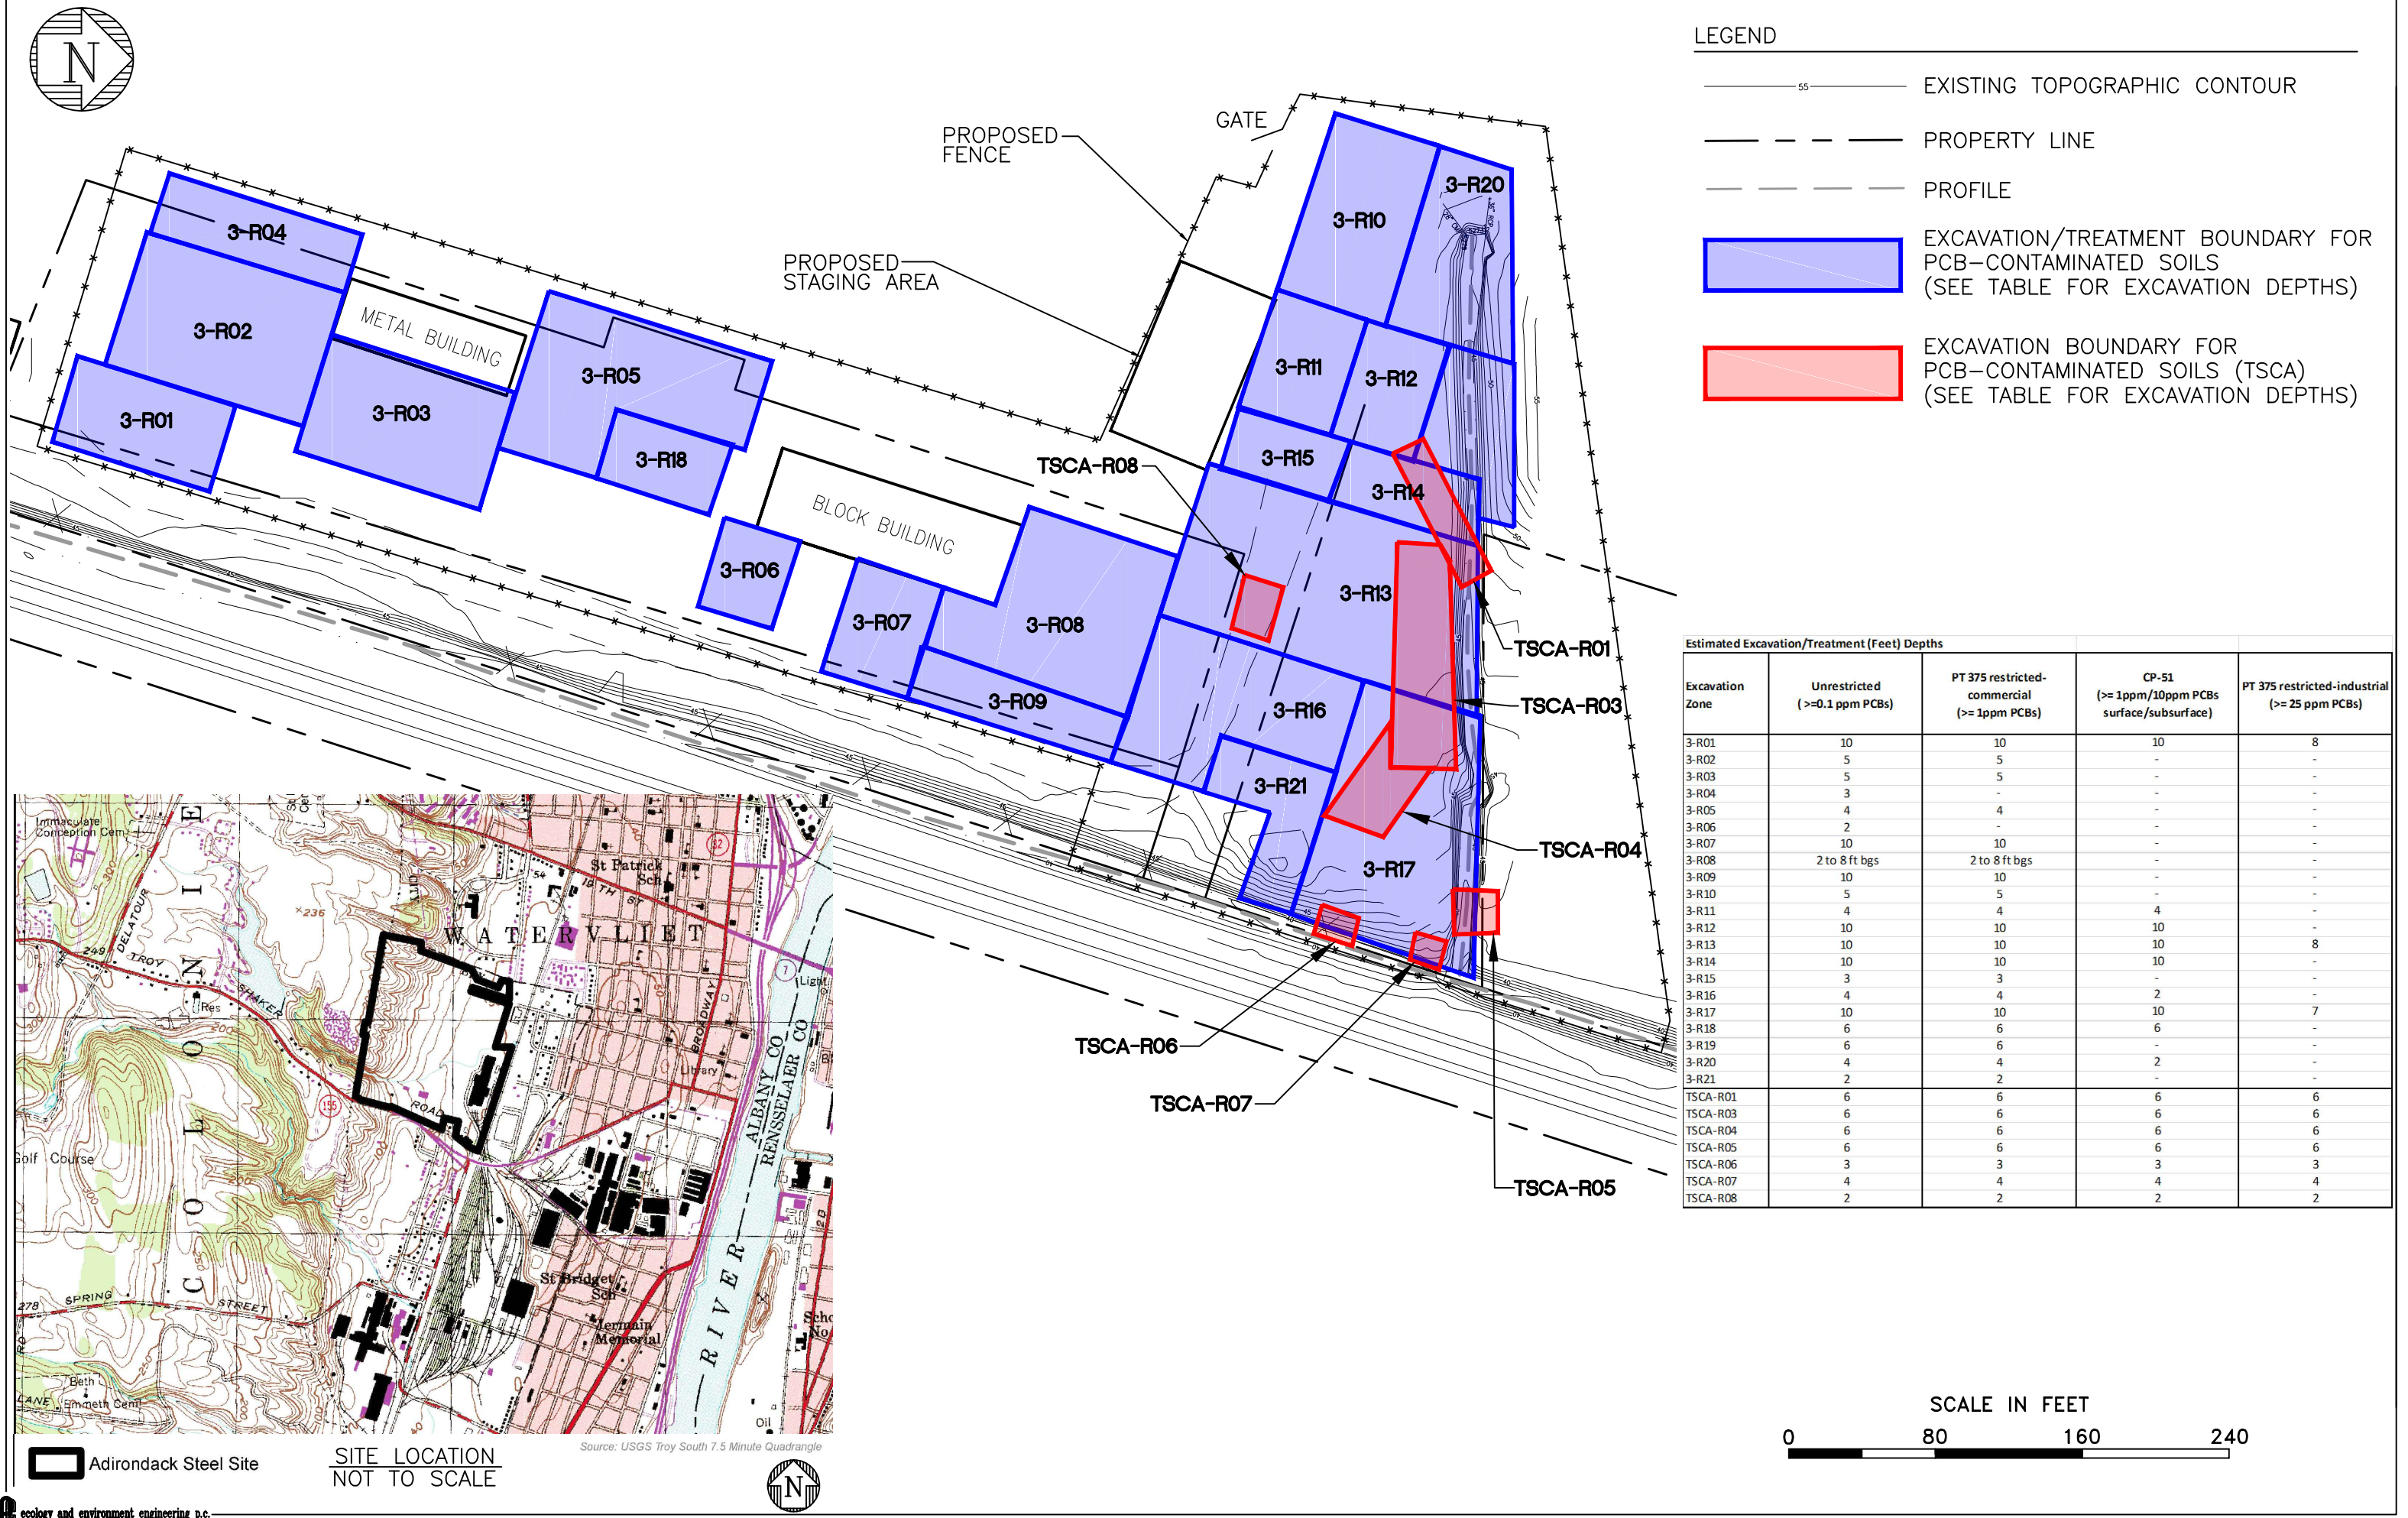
EXCAVATION AND TREATMENT EXTENTS, ADIRONDACK STEEL OU-3 FORMER ADIRONDACK STEEL SITE COLONIE, NEW YORK
